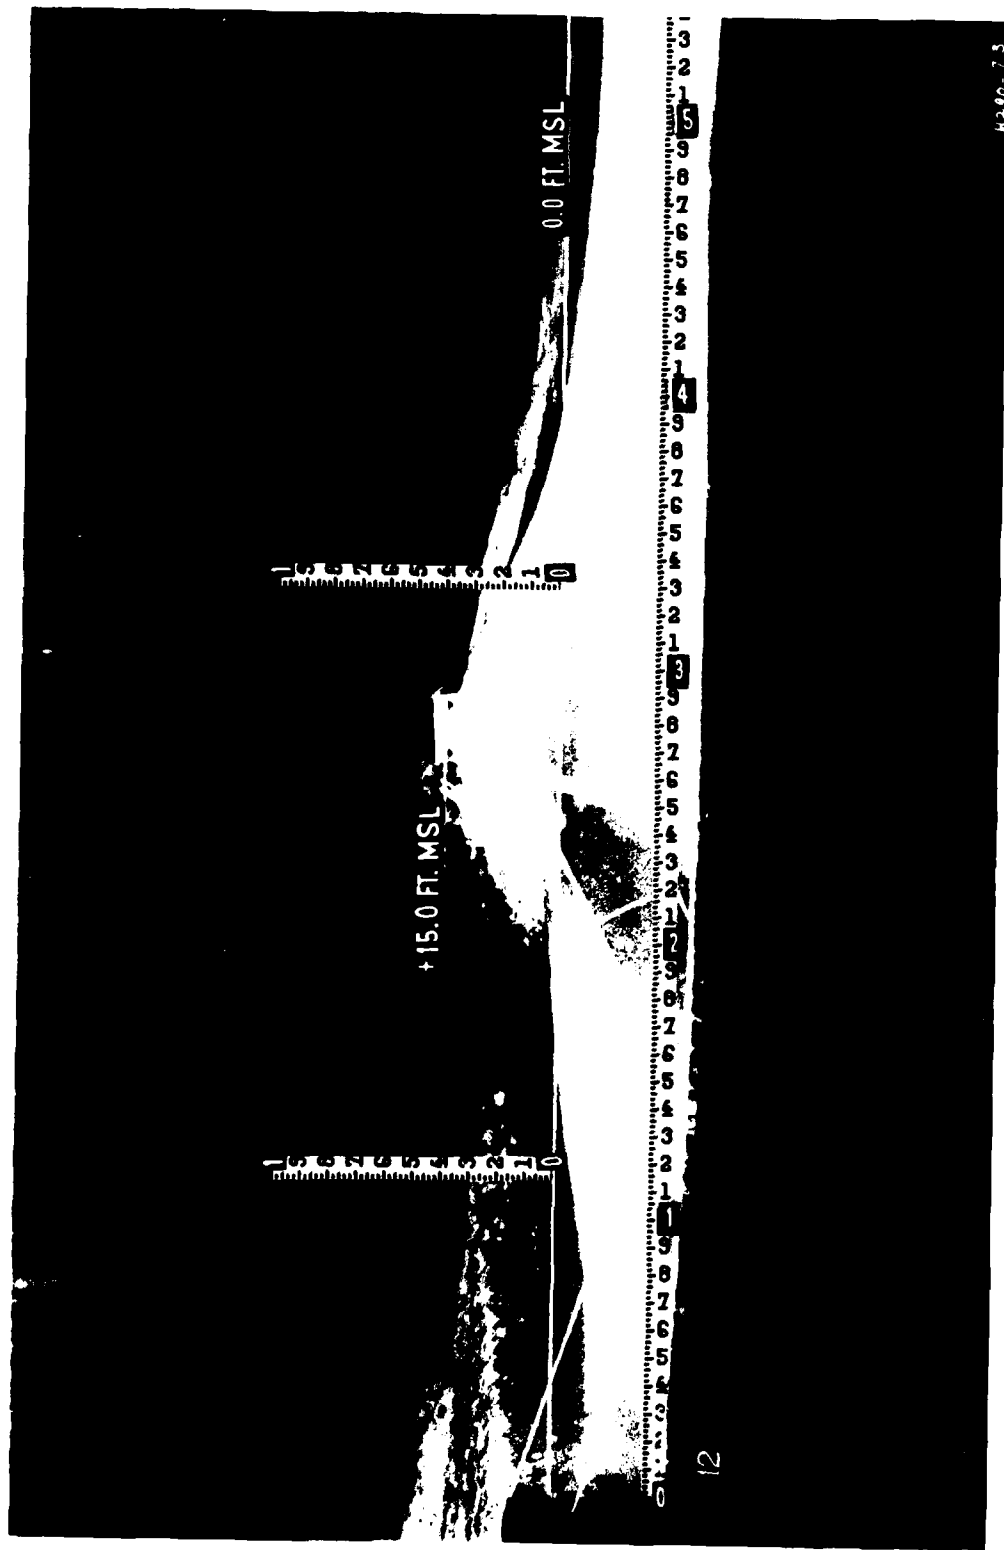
Side view of Plan N-3-A with trestle on north slope, 9.0-sec,
